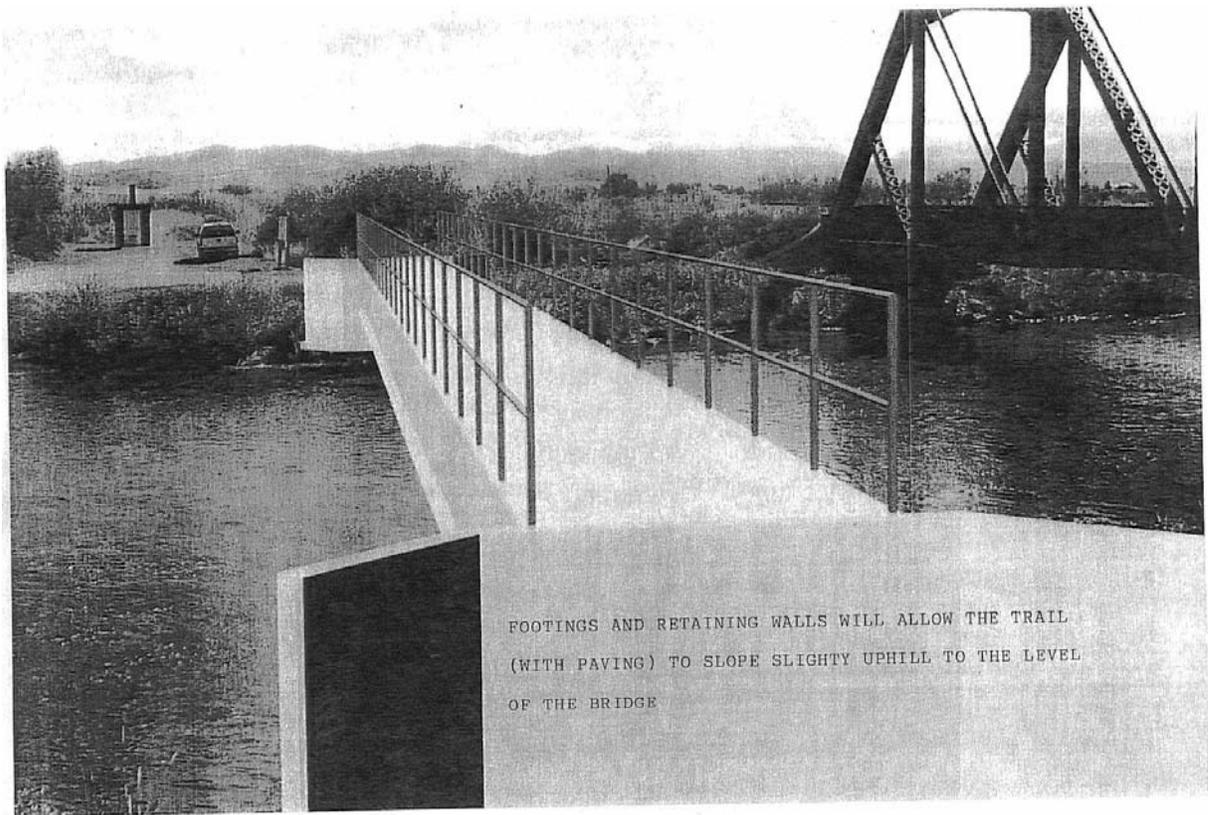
Engineer's conceptual drawing of the proposed pedestrian/bicycle bridge. The actual bridge design includes chain link fabric on the railings and grated decking. Milwaukee FAS can be seen across the river.
